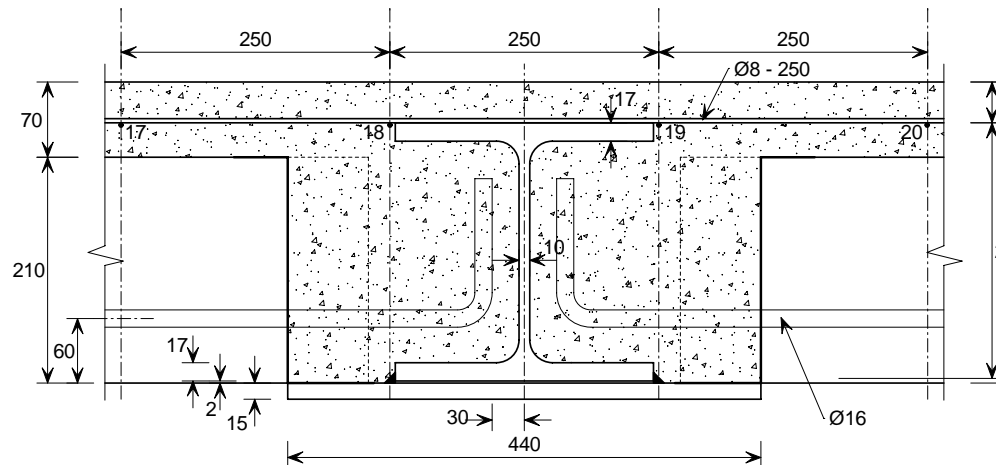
Location of thermocouples on the reinforcement over the internal beam at position BD
